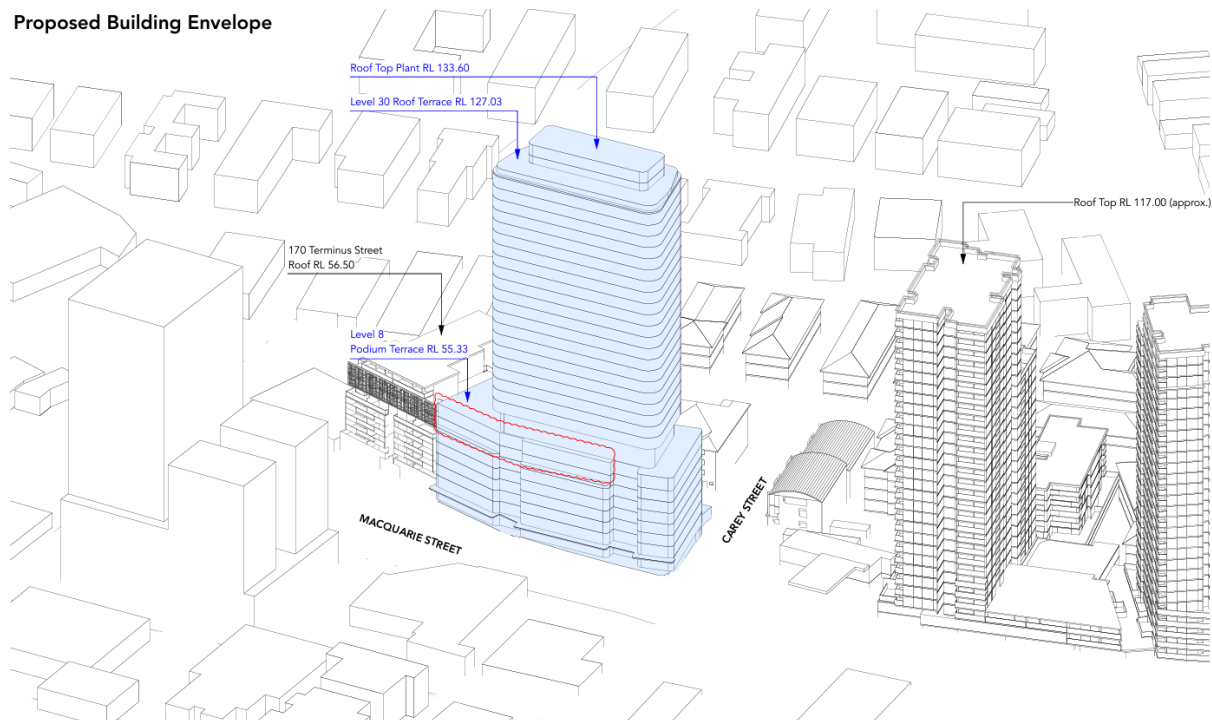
Building Envelope Plan showing proposal relative to its development context.
